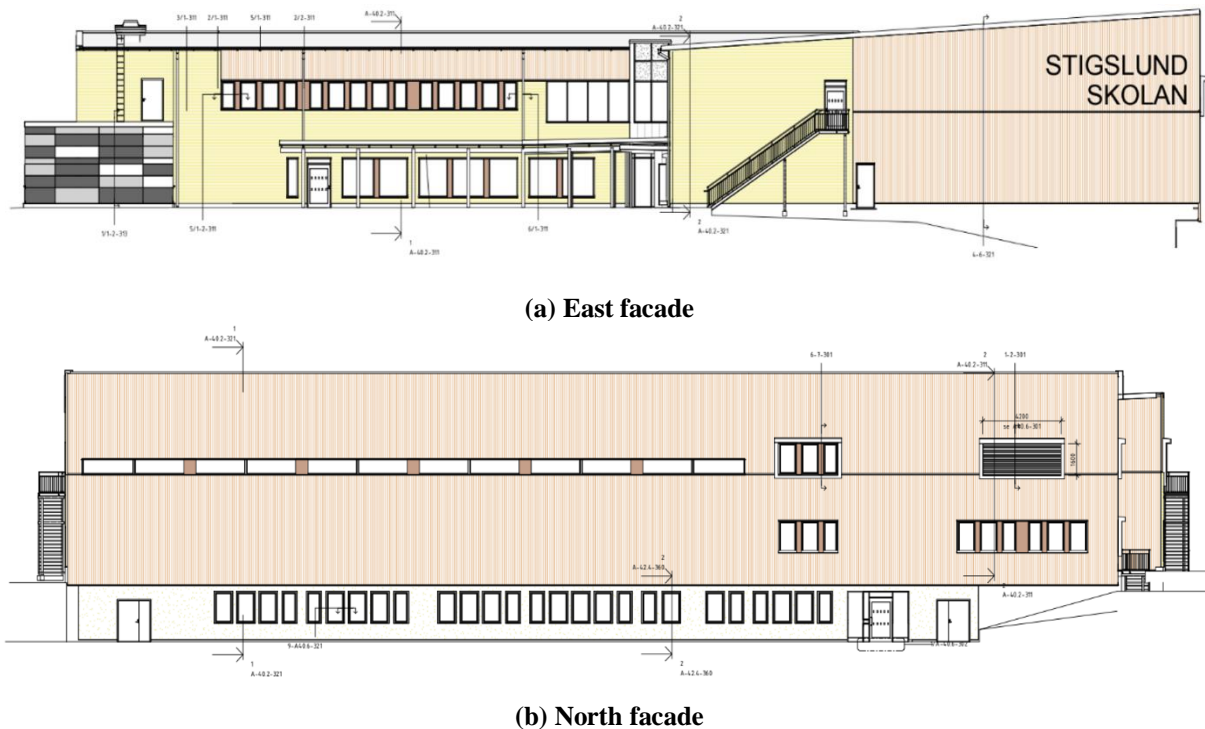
Facades of building: (a) East facade, (b) North facade.
